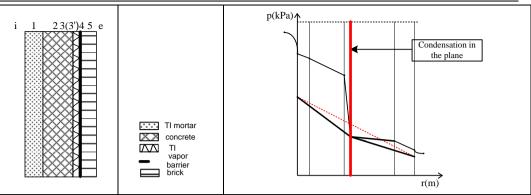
The assembly layout and water vapor diffusion diagrams in the assembly 5
